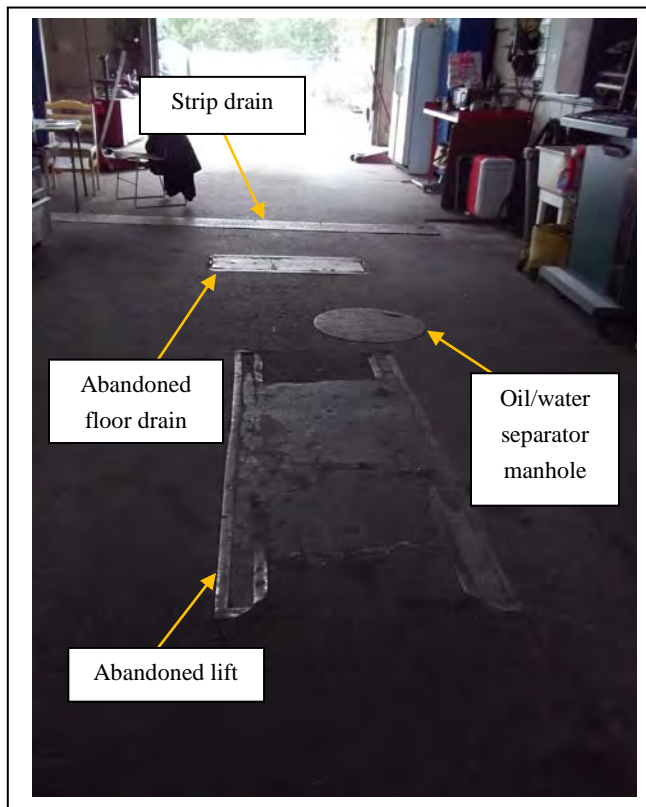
Interior of the 3607 Spenard Road structure. (August 17, 2012)
